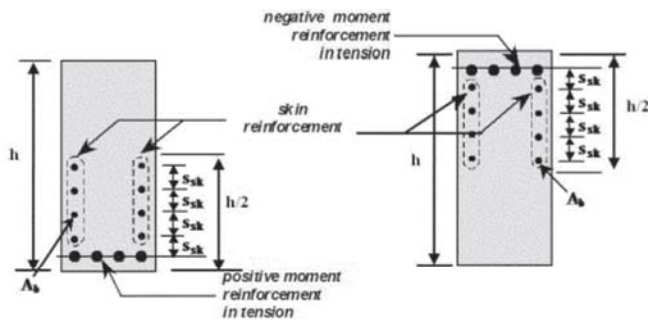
Skin reinforcement for girders, beams, and joists with $h > 36$ in. (900 mm).
